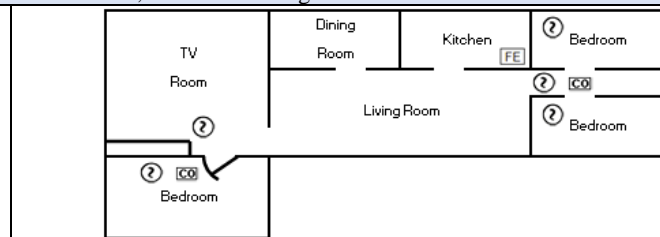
In dwelling units with more than one sleeping area, a smoke alarm shall be provided to protect each sleeping area in addition to the alarms required in the bedrooms.
